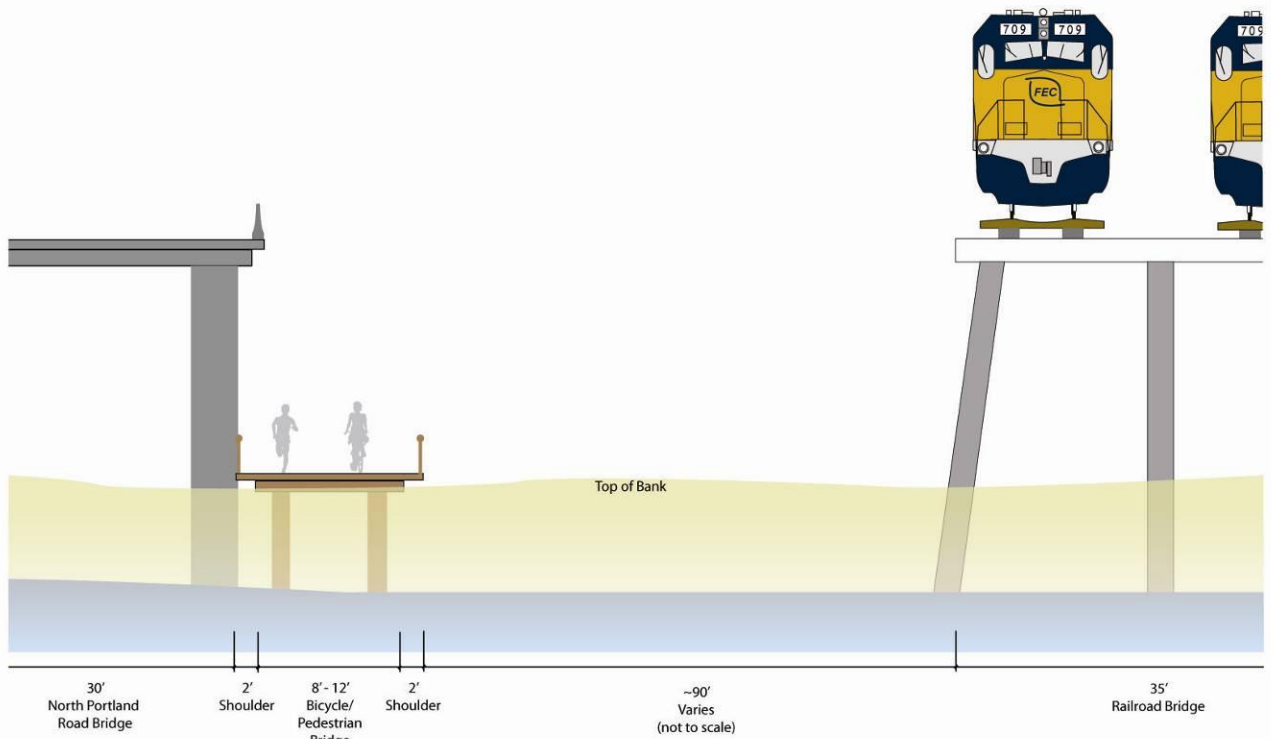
Bicycle/Pedestrian Bridge adjacent to North Portland Road
